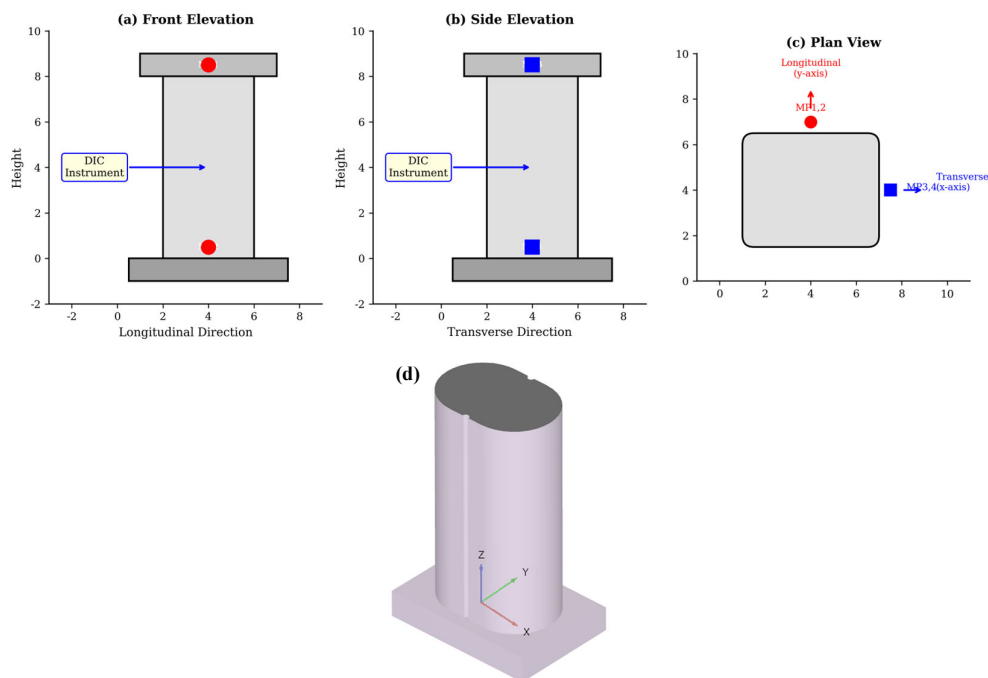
Layout of monitoring points (MP) on a typical existing HSR pier. (a) Front elevation for longitudinal (y) and vertical (z) measurement. (b) Side elevation for transverse (x) and vertical (z) measurement. (c) Plan view (d) 3-d view showing the orientation of the measurement axes.
